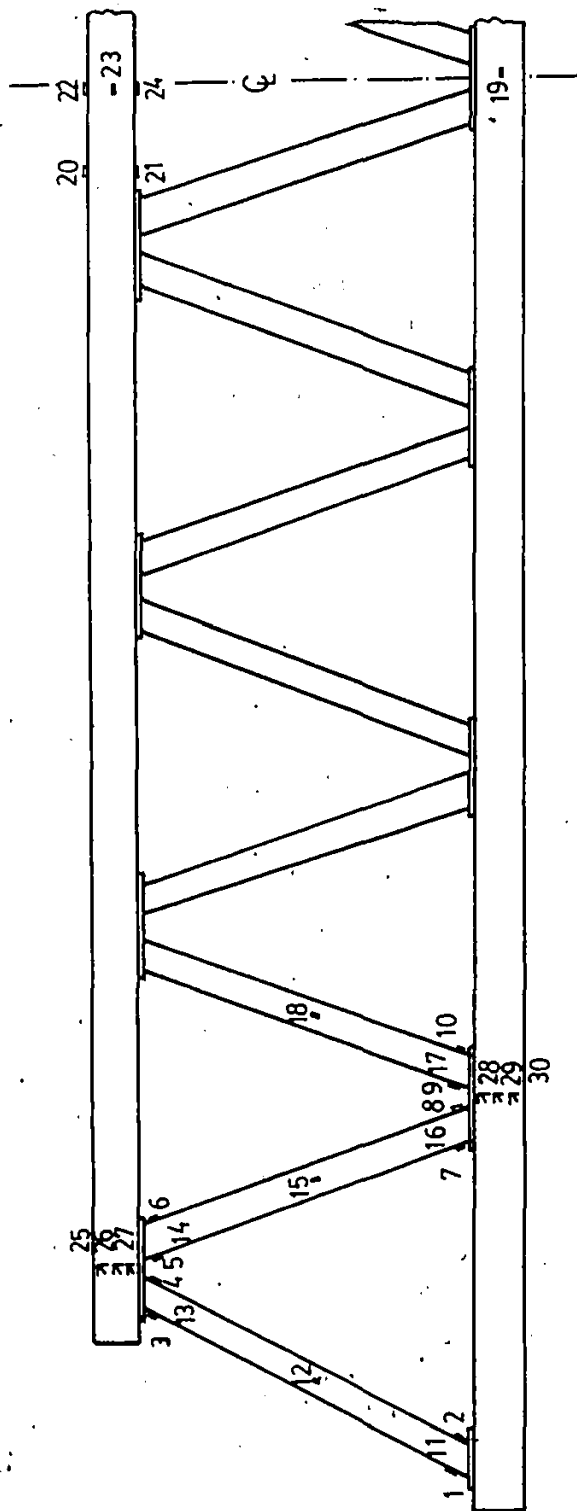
LAYOUT OF STRAIN GAUGES & ROSETTES FOR TRUSS BBST
